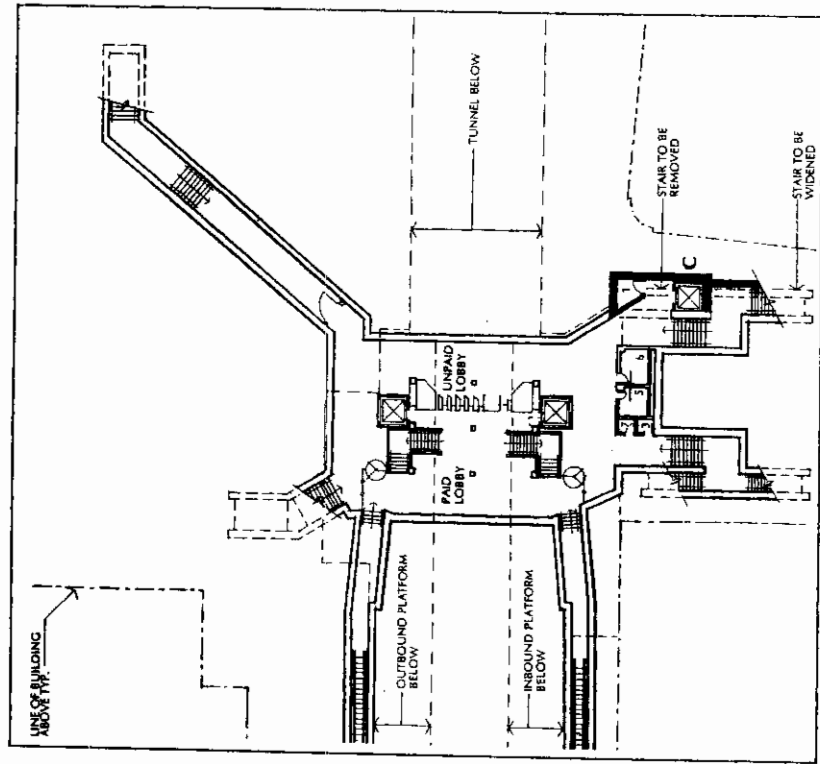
Elevator Option C, mezzanine level Scale: 1"=32'
